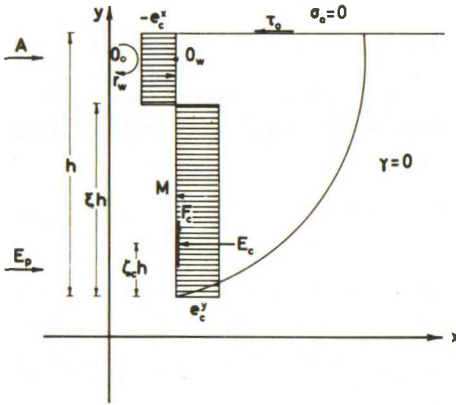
A: An Anchored Sheet Wall. Earth Pressure Distribution by Brinch Hansen's Approximation.
